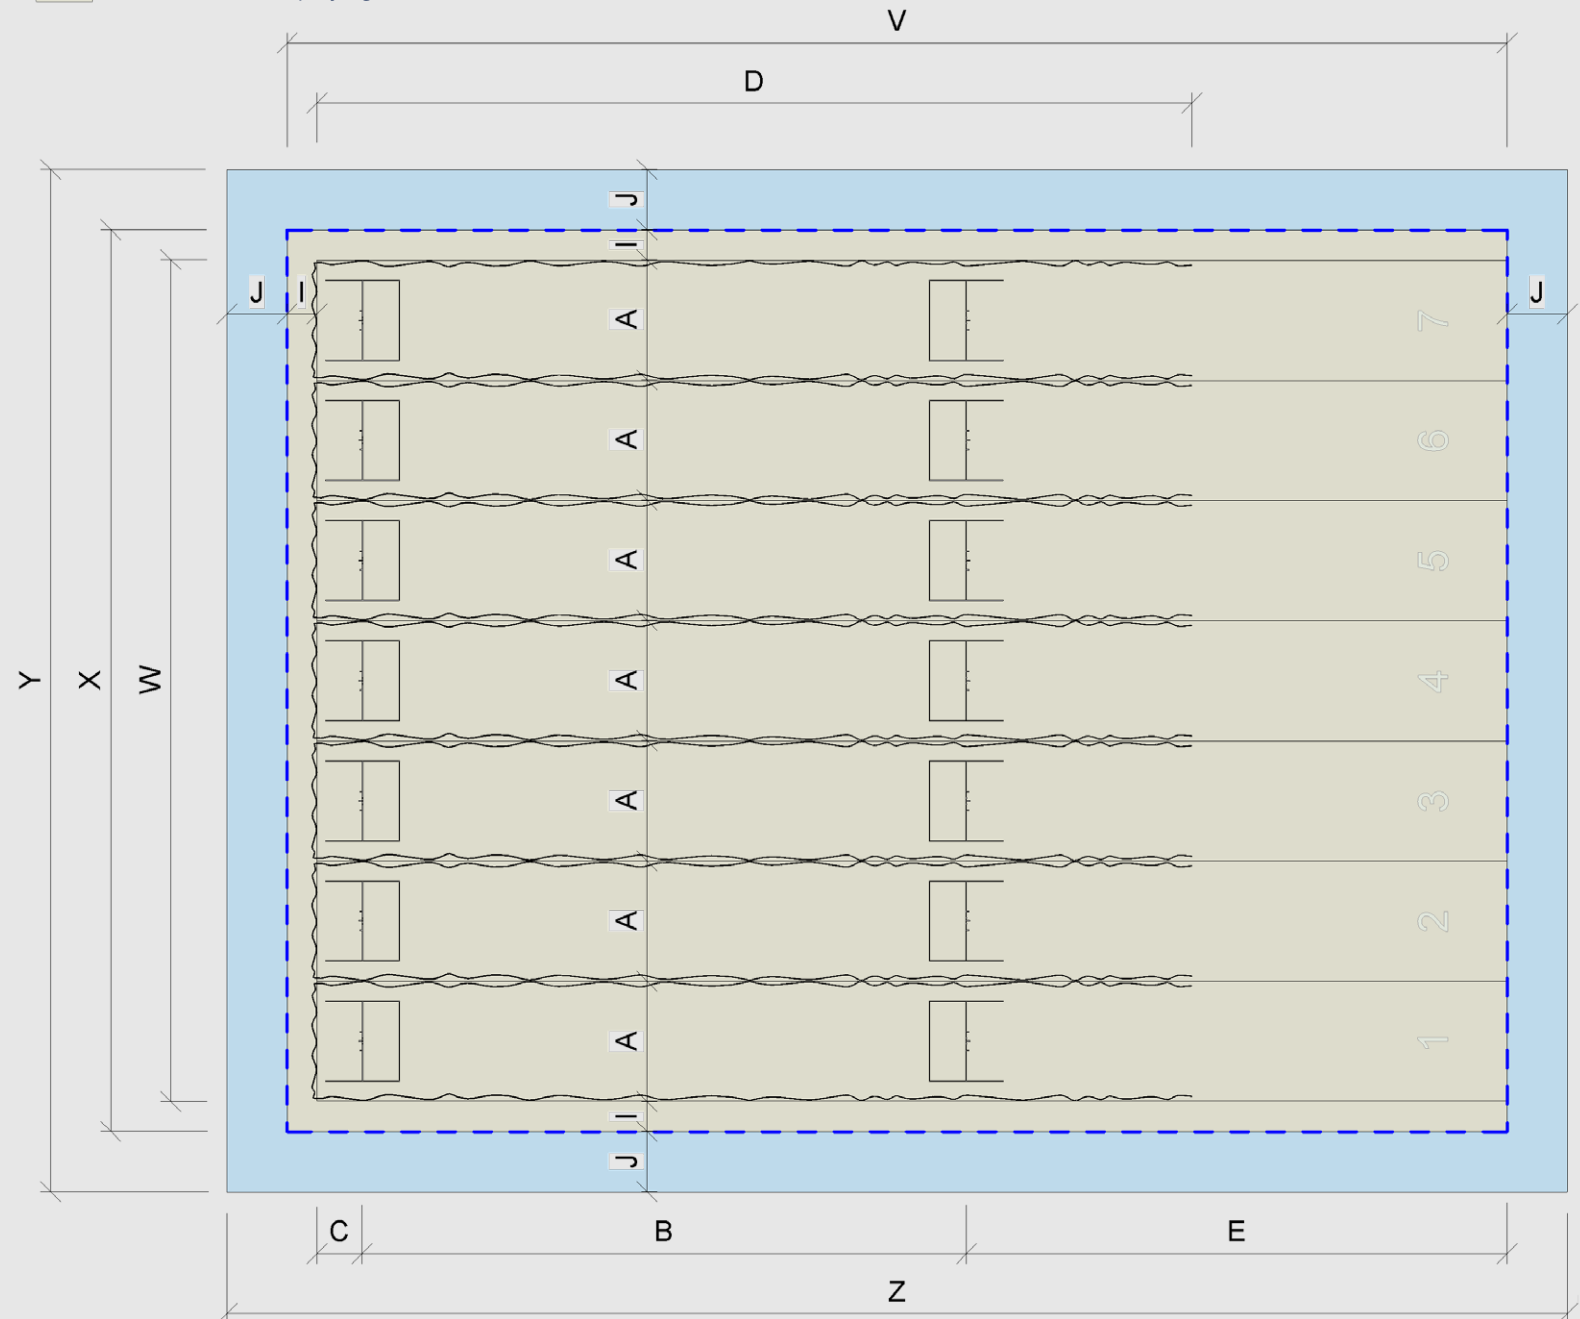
Plan diagram shows an example seven-lane Covered Outdoor Cricket Facility with a longer 18 m run up which also creates additional playing space.
